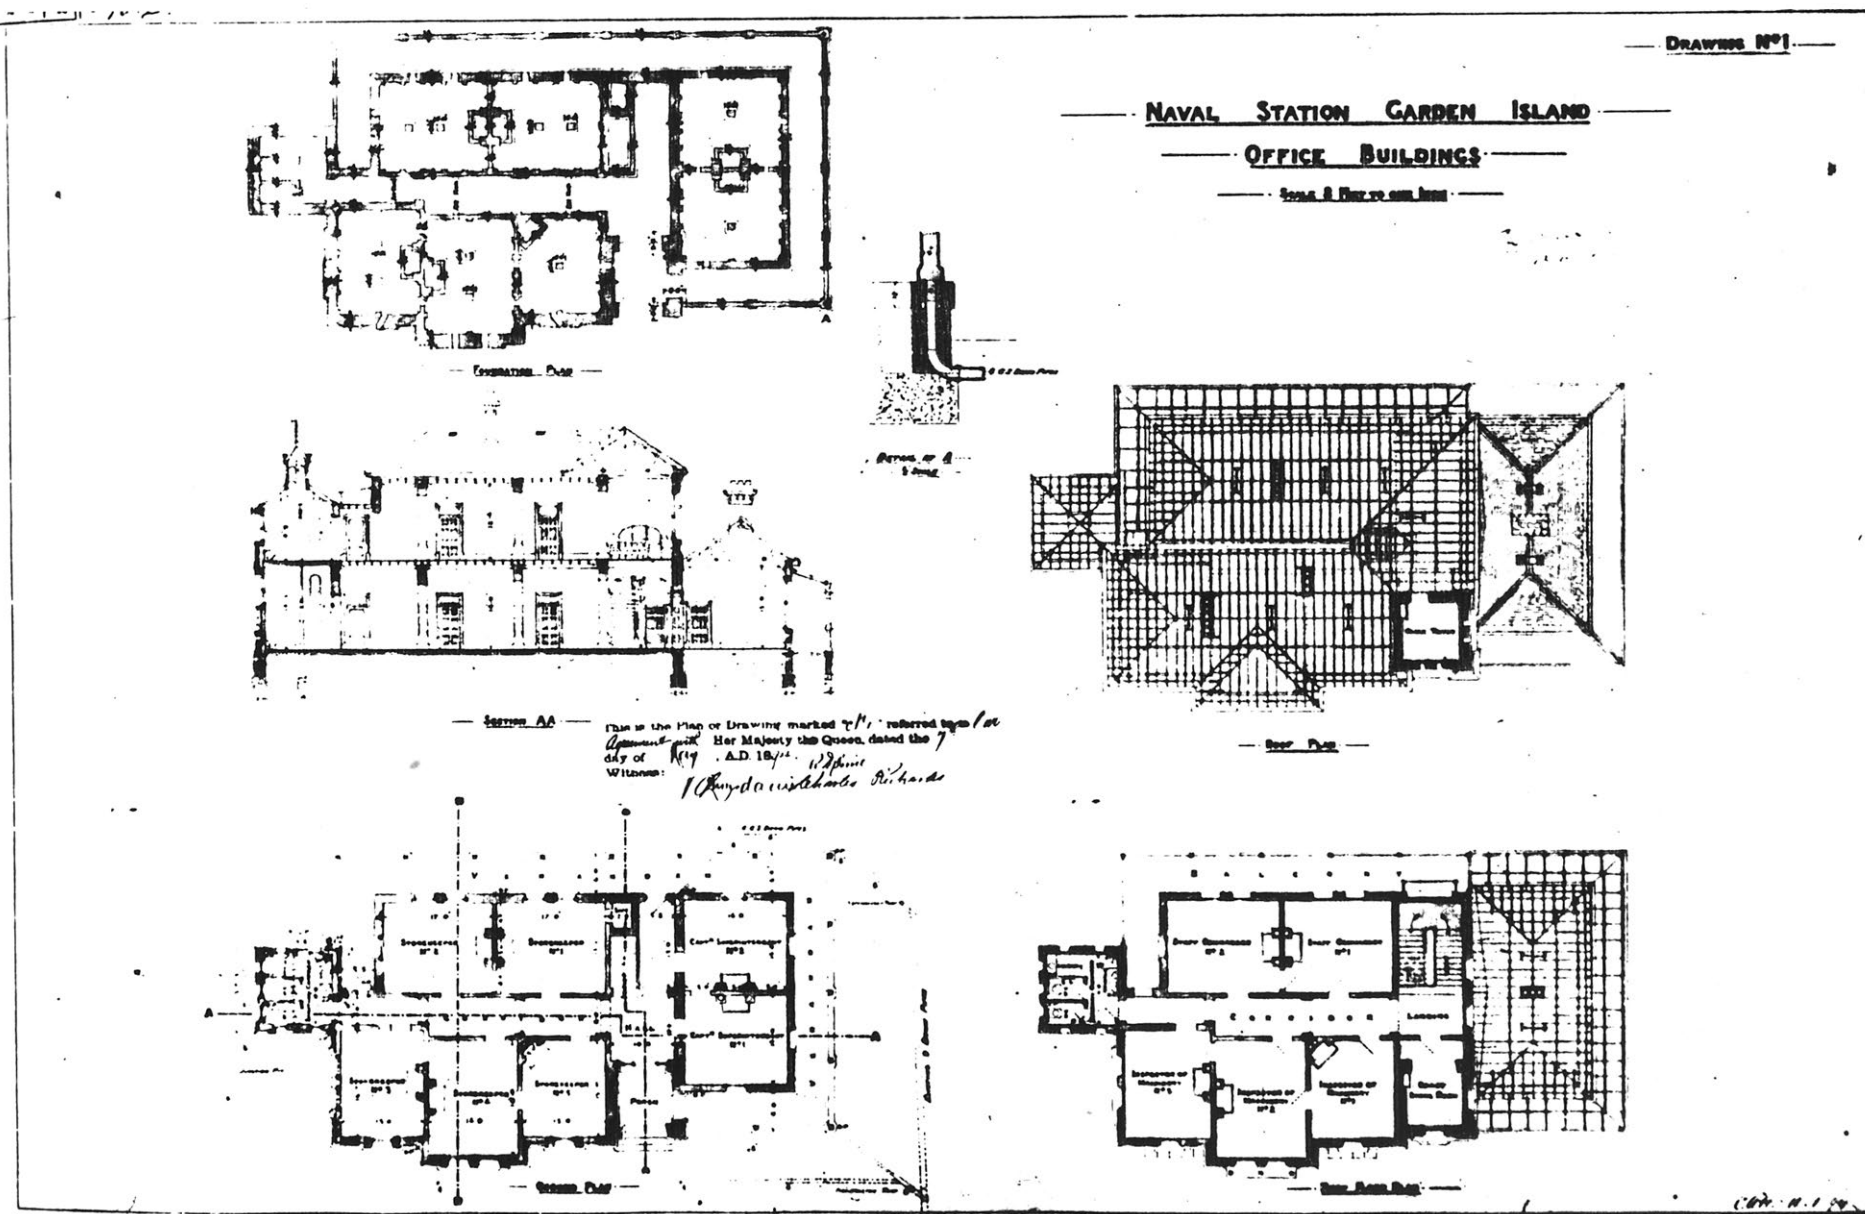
Office Buildings (Building 27) - Plan & Elevations, 1894
